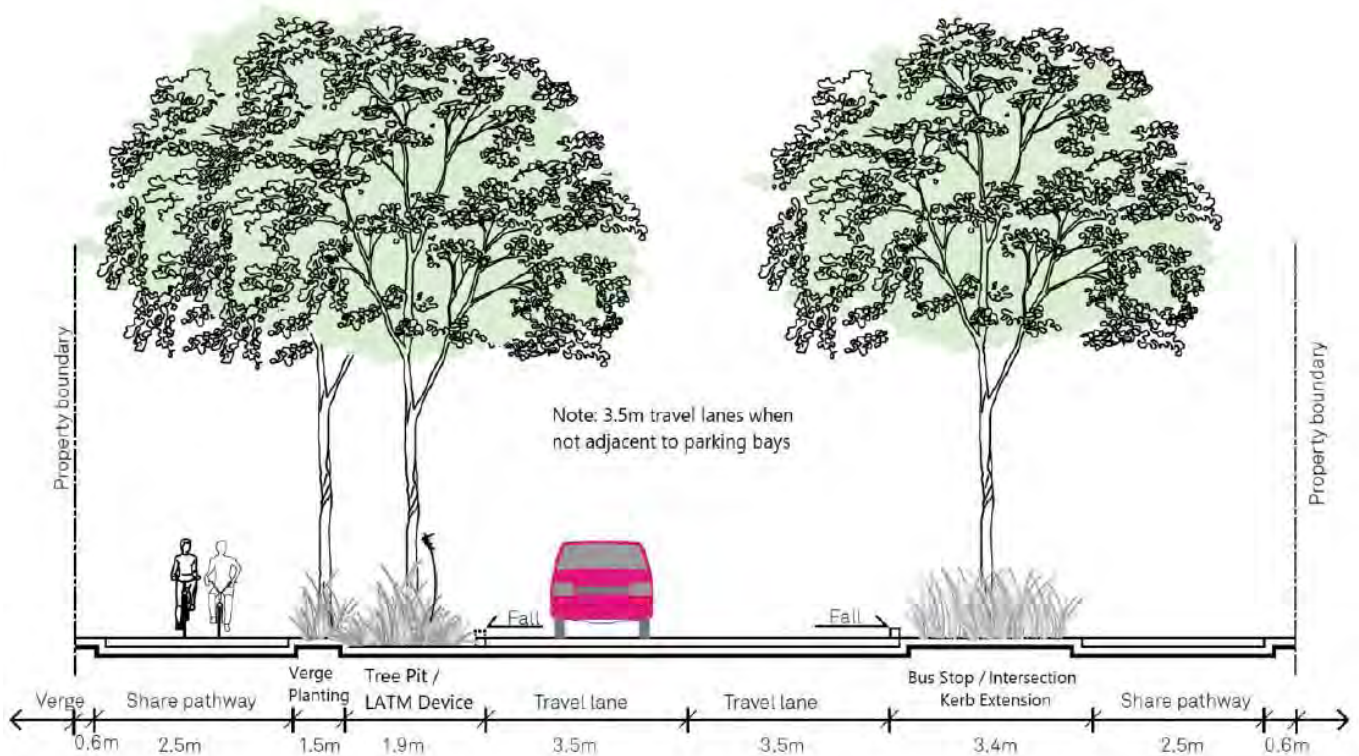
Collector Road LATM, Tree Pit, Bus Stop or Kerb Extension Details
